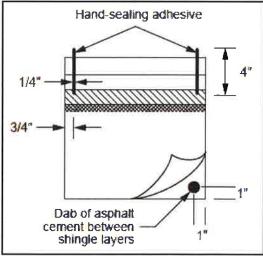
Use six nails and four spots of asphalt roofing cement on steep slopes.
